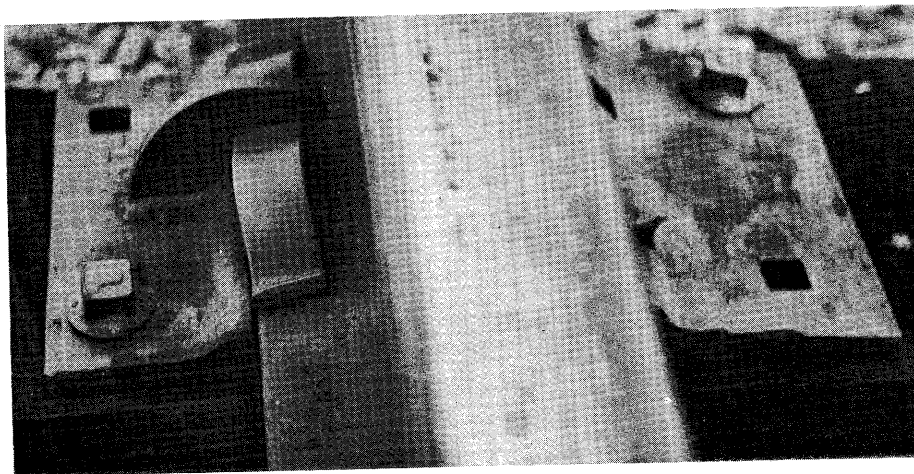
Section 31, G&H No-Creep Rail Anchor and 2 Oliver Tie Plate Drive Spikes on Alternate Ties.
